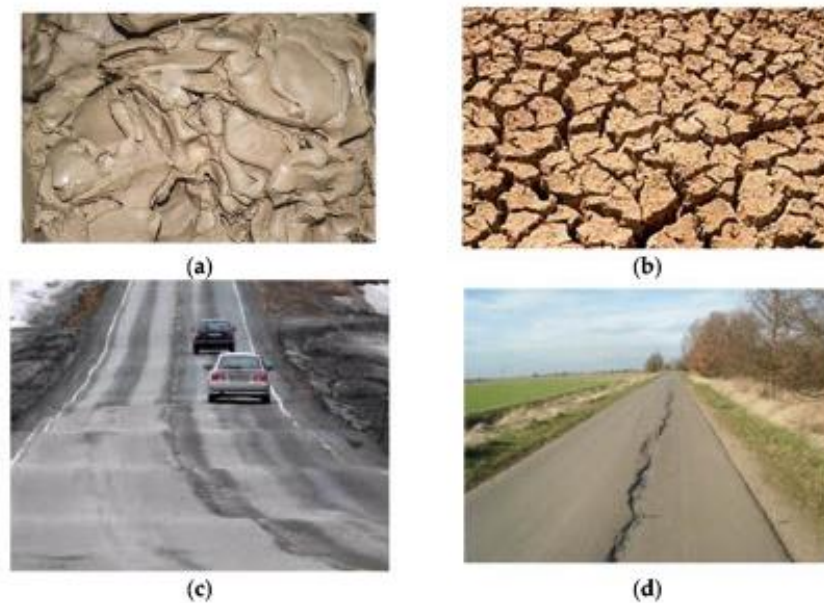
(a) Typical wet expansive soil [4]; (b) Typical dry expansive soil [4]; (c) Uplifting of flexible pavement [4]; (d) Typical longitudinal crack on road pavement due to expansive subgrade [4].
